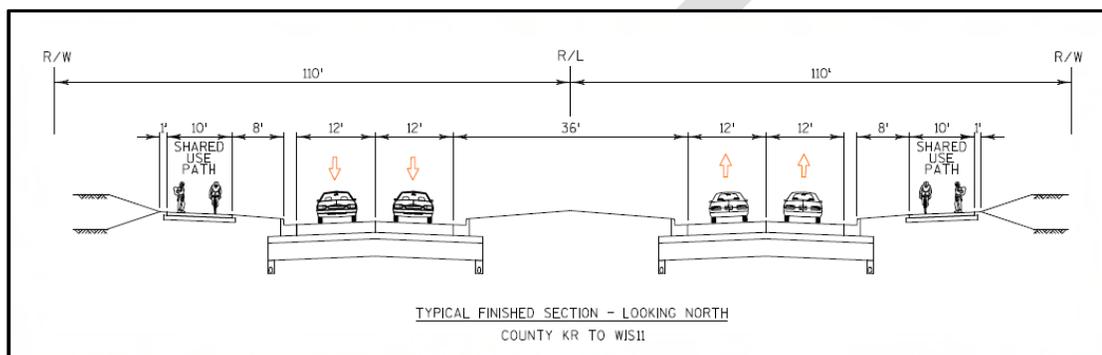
Wisconsin Valley Way Typical Section (Source WisDOT Public Exhibit – 3/15/18)
